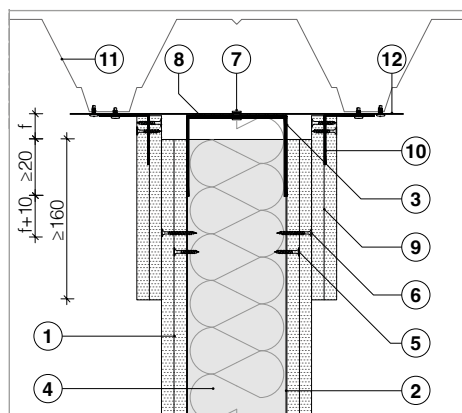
Connecting a partition wall with trapezoidal sheet panels using plasterboard "curtains" – along the trapeze
